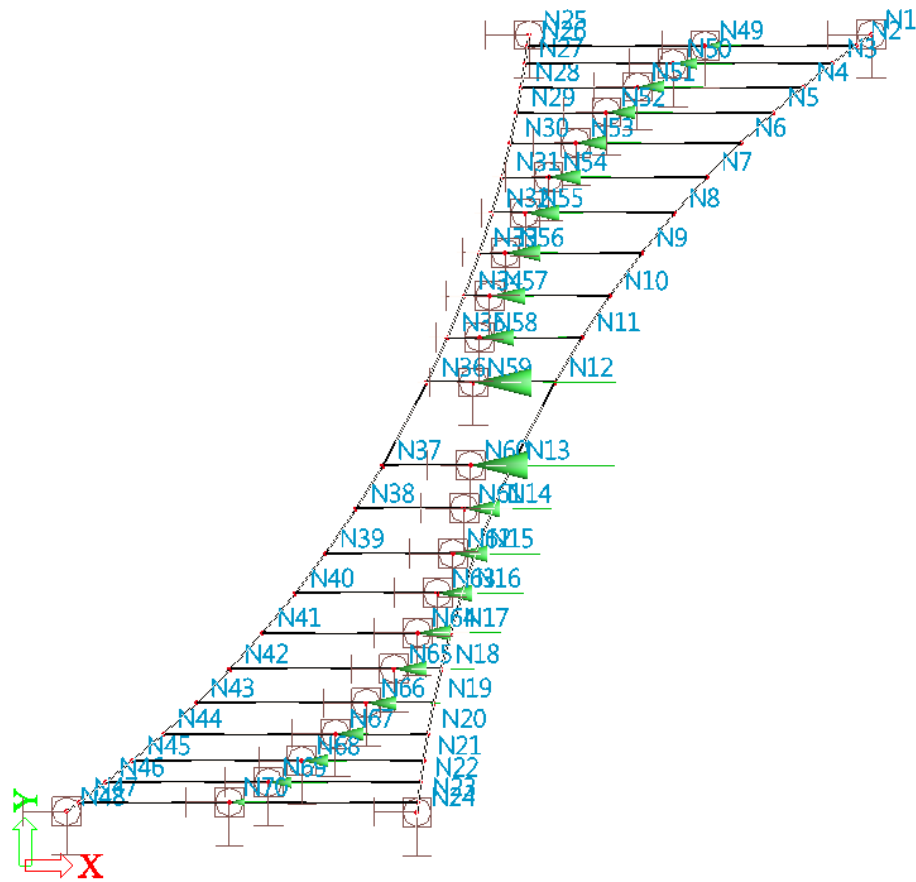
APPLICATION HORIZONTAL LOADS ON ANCHORING SYSTEM
